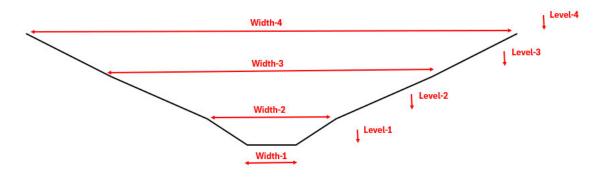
Definition of cross-section geometry of compound trapezoidal shaped upstream outlet channel component of Tekapo B Power Station temporary tailrace channel
